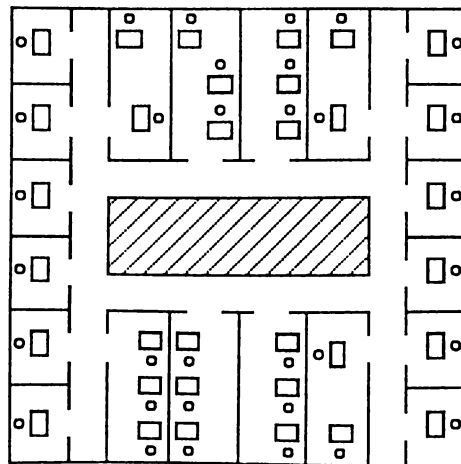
Single Office Type Planning (Erbuğ, 1987)
